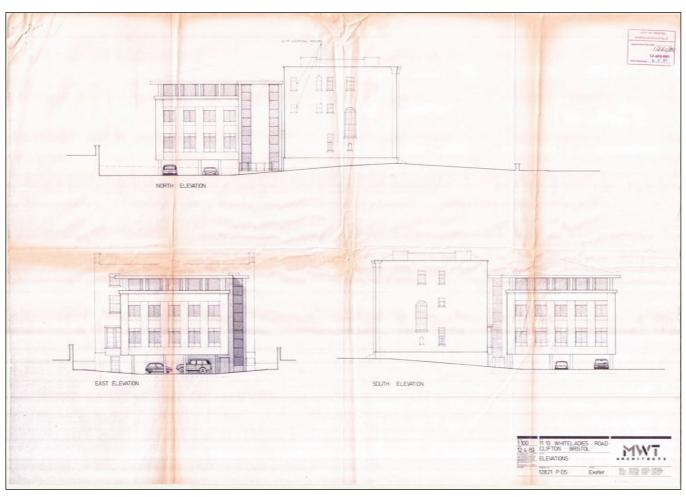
Elevation drawing from consented application for demolition of Annex and erection of a 4 storey office extension. Planning reference 89/01364/L. Never implemented
